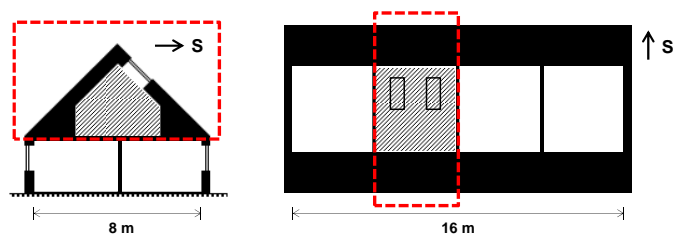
Sketch indicating the location of the loft room in the middle part of a 1½-storey single-family house with simplistic floor plan: Vertical section of the house to the left and horizontal section of the 1st floor to the right.
